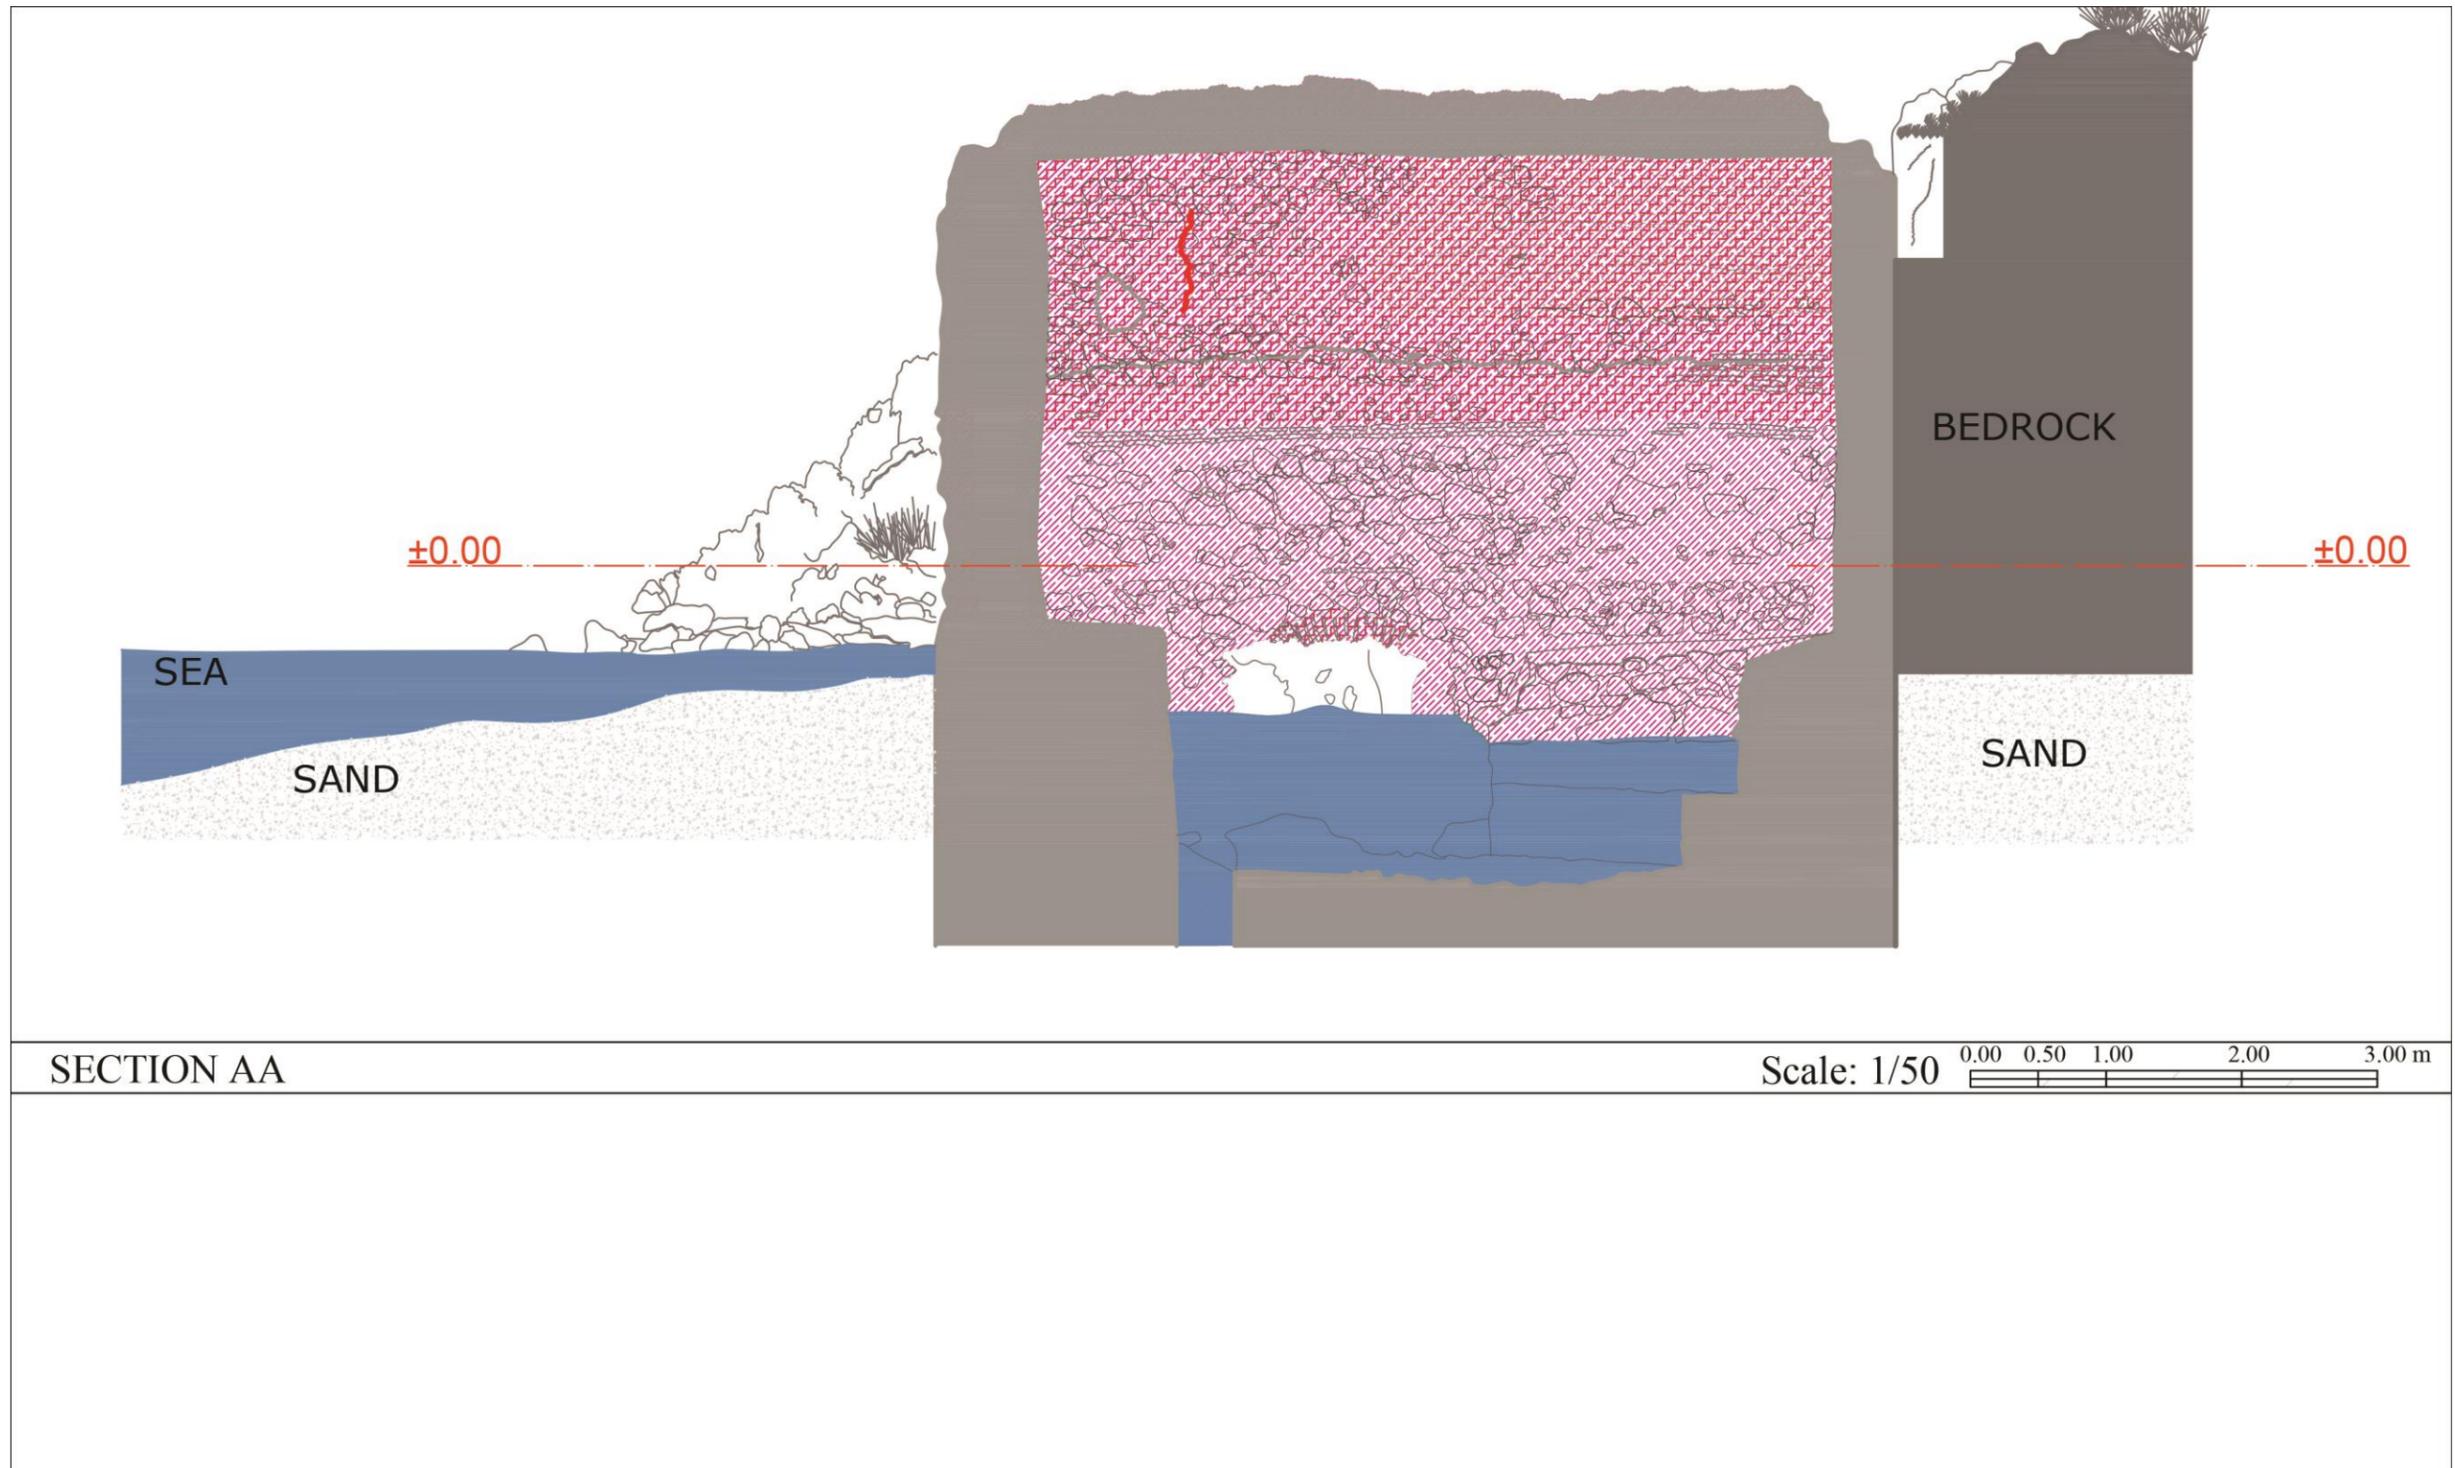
Section A - Structural Failures and Material Deterioration
